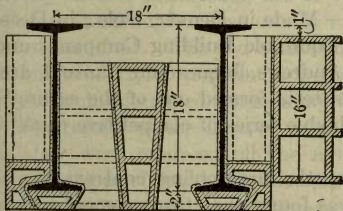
Double I-Beam Girders projecting below Ceiling.
